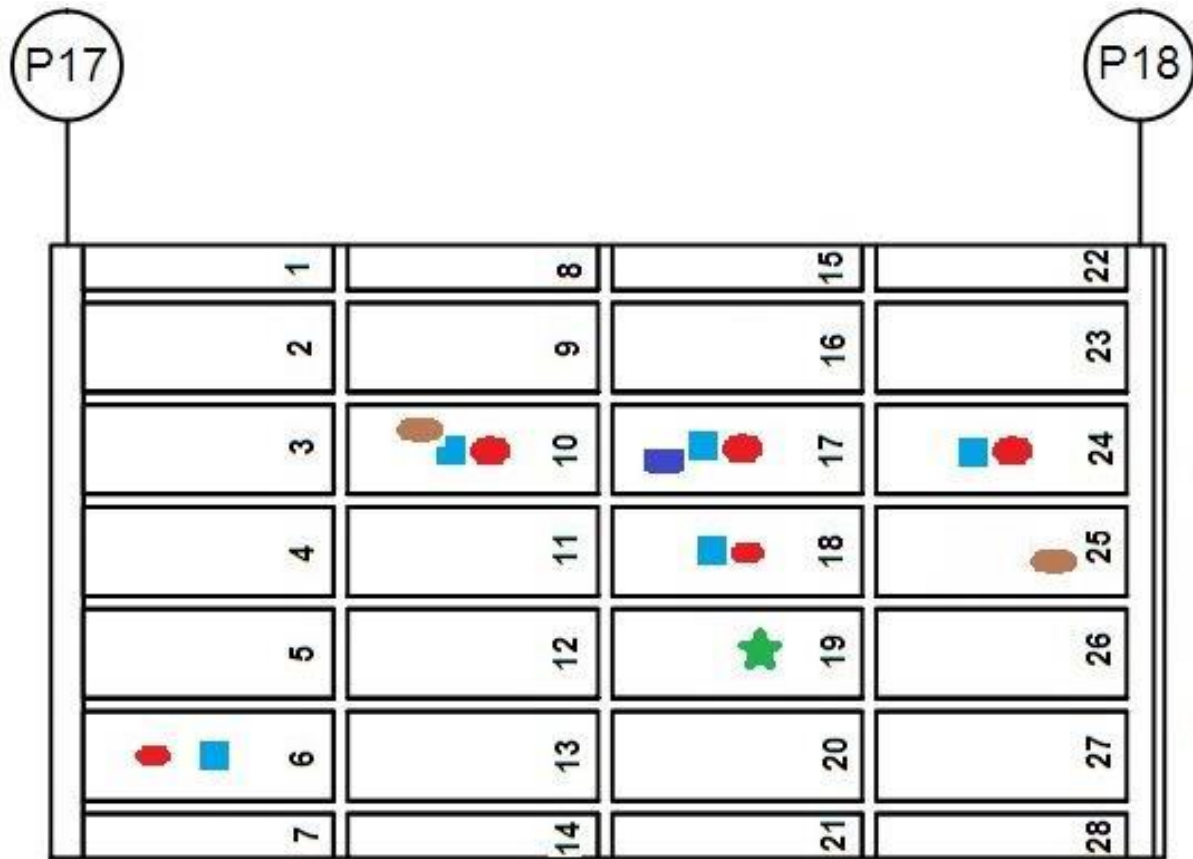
Test conducted at various locations between Pier P17 and Pier P18
